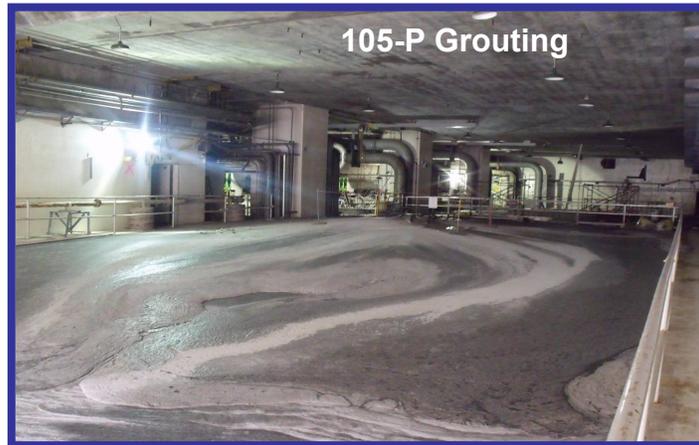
Grouting of P Reactor at -20 and -40 elevations
